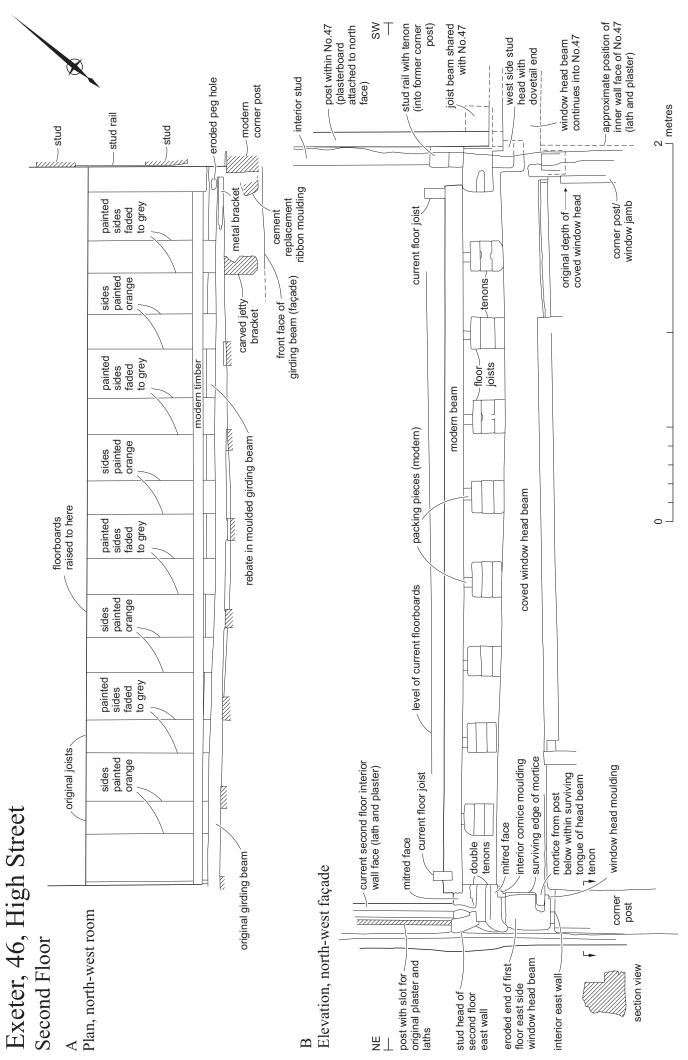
(A) Plan of exposed joists in the second floor north-west room and (B), elevation showing the exposed joist ends after removal of the moulded girding beam. Scale 1:20.
